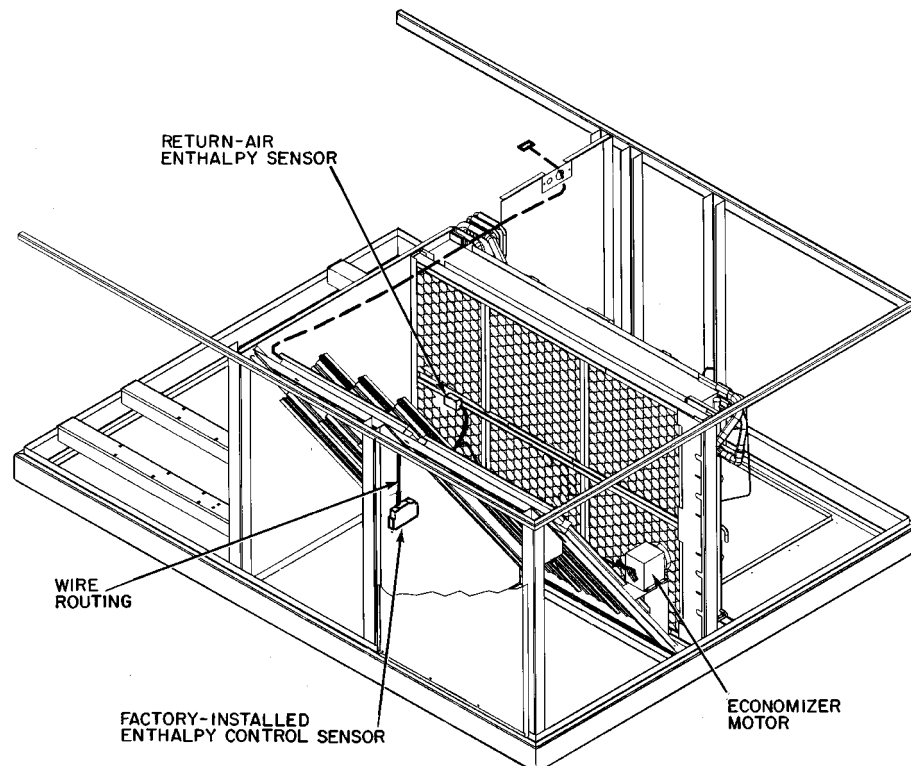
Return-Air Enthalpy Sensor Installation and Wire Routing, 024-030 Units
